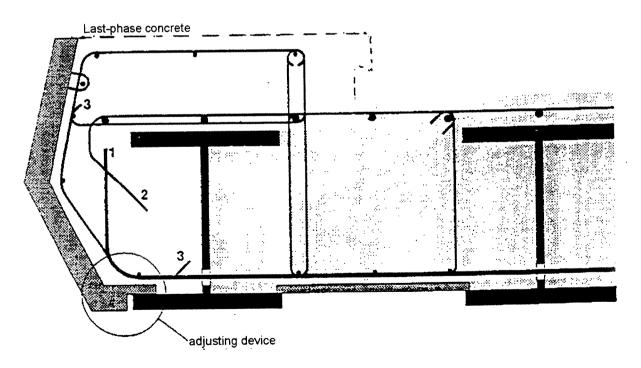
Principles for the reinforcement details at the free edges and for the prefabricated concrete face plates.
